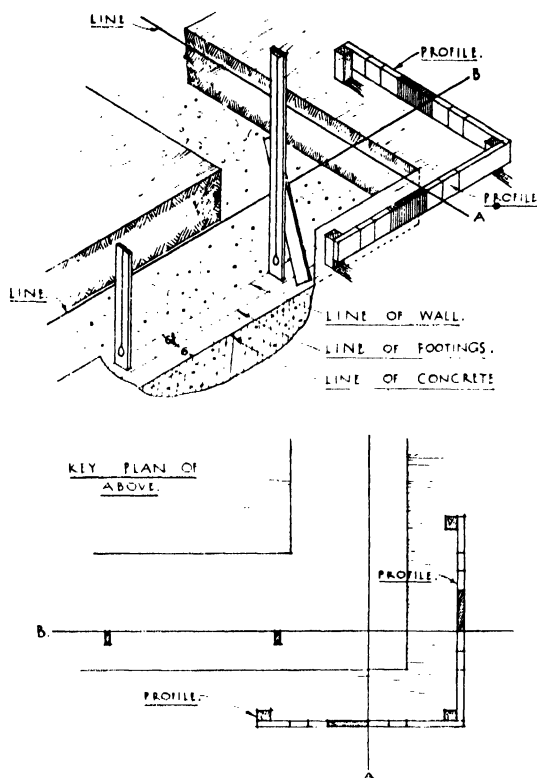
SETTING OUT A QUOIN OF A BUILDING
